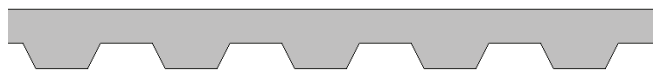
Diagram of Case 2 floor construction - Corrugate steel deck
